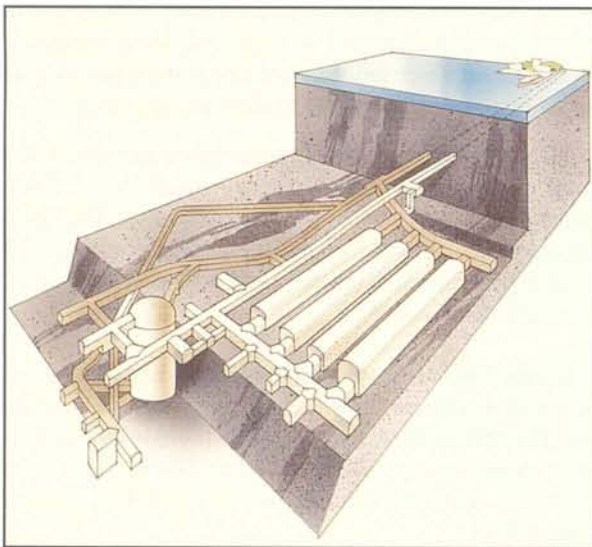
Overview of tunnels and storage chambers in the first construction stage of SFR.
